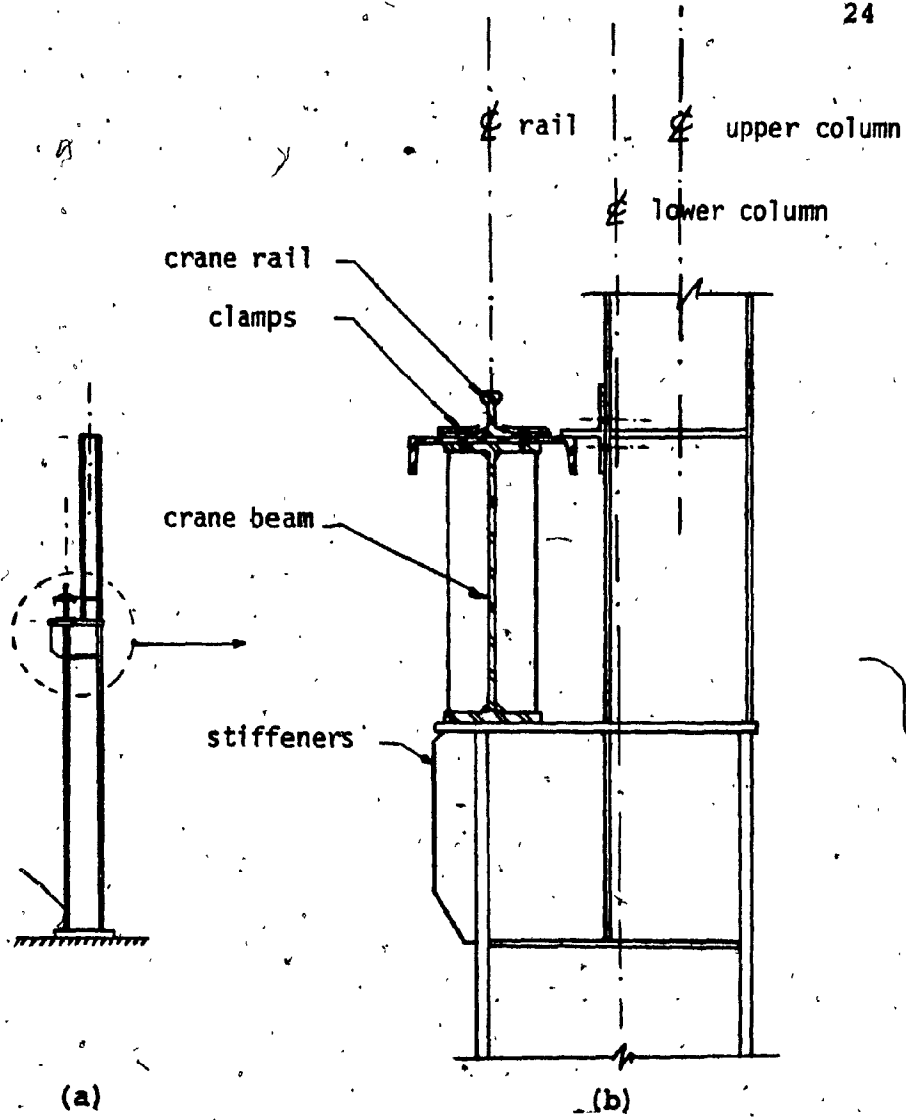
TYPICAL SINGLE STEPPED COLUMN AND CRANE BEAM DETAIL
